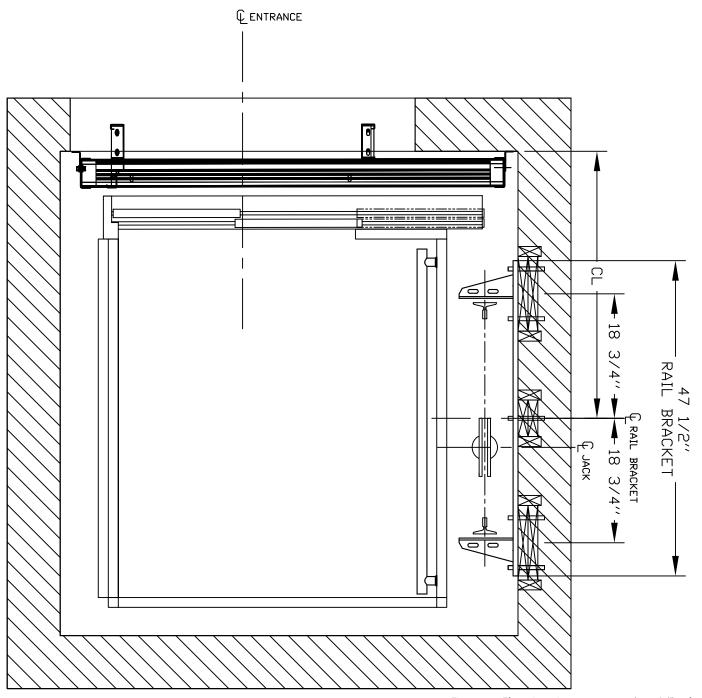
Elevation view - 2000 mm (78 3/4") cab
